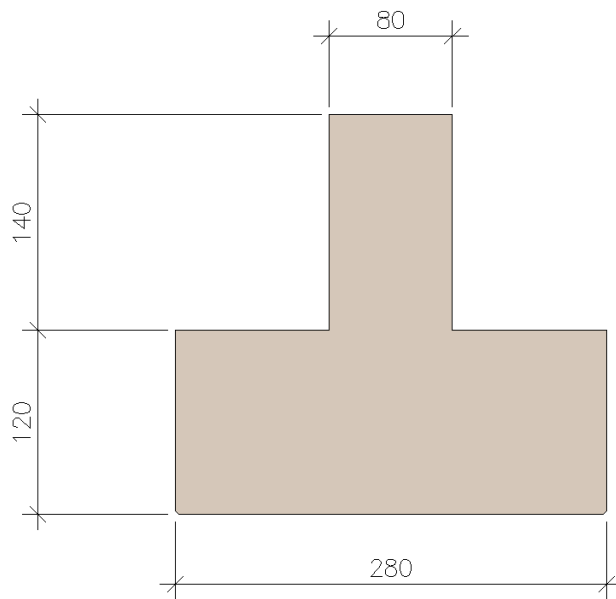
Inverted T-shape cap beam section at pier line P (units in cm)
